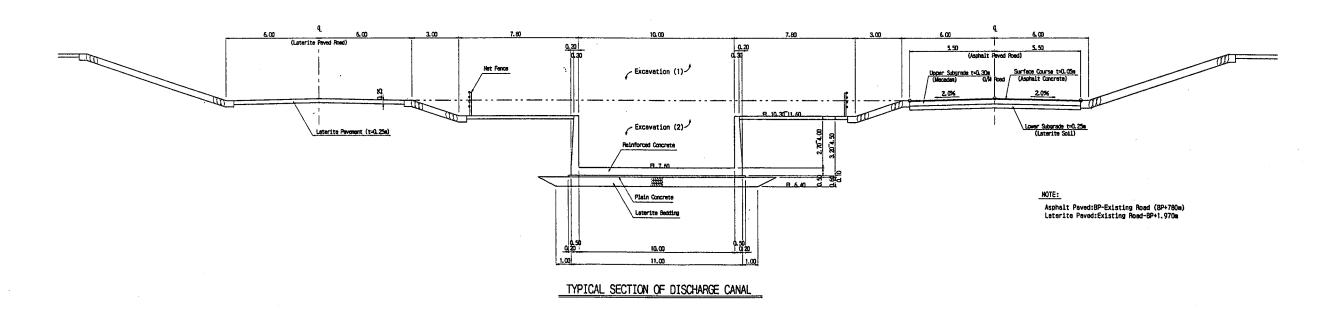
Profile and Section of Spillway Outlet Channel
